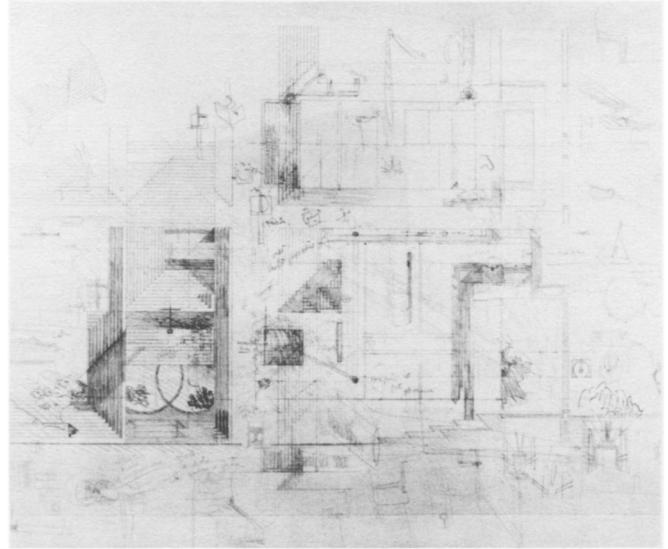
Carlo Scarpa. Entry, Brion Cemetery, Elevation and Section.
